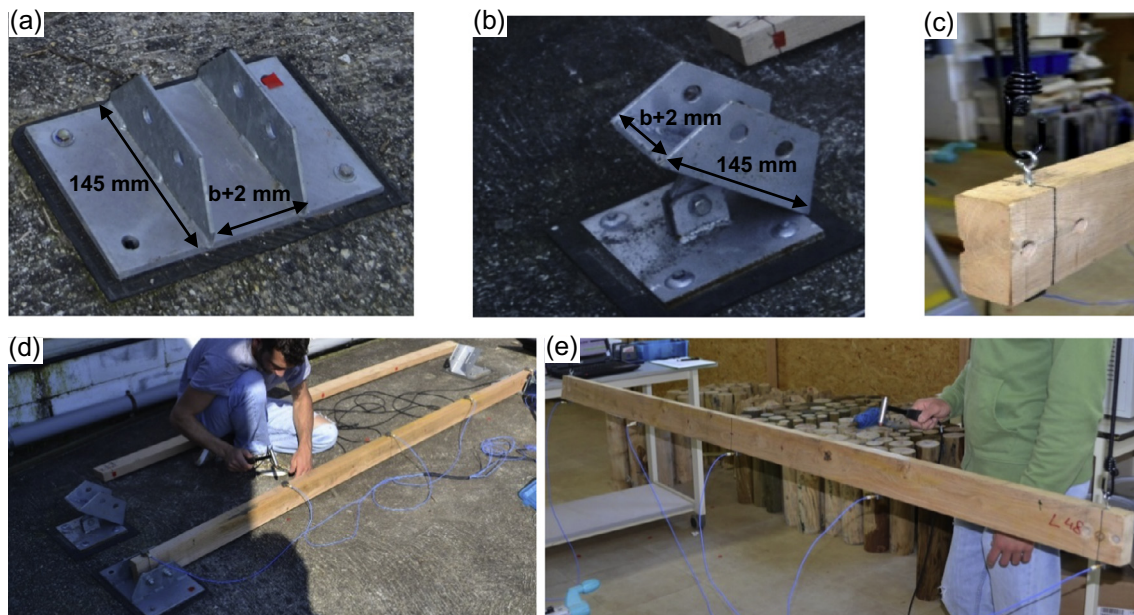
Details of the: (a) simple support A, (b) hinged support B and (c) suspended beams; and experimental tests on: (d) supports A and B and (e) suspended beam.
